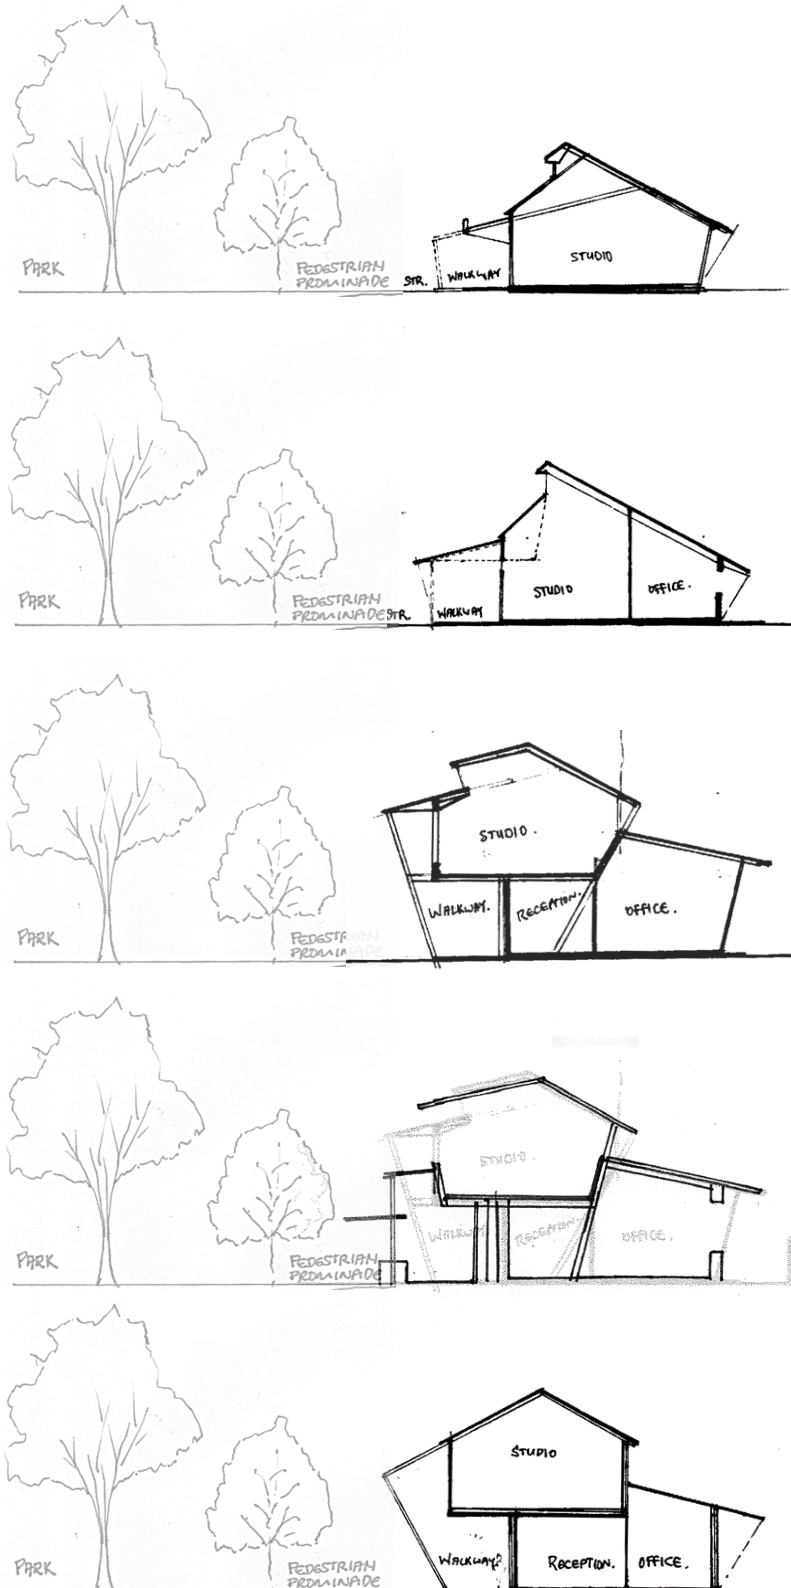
Section Development of Performed Arts Building (Author 2020)
